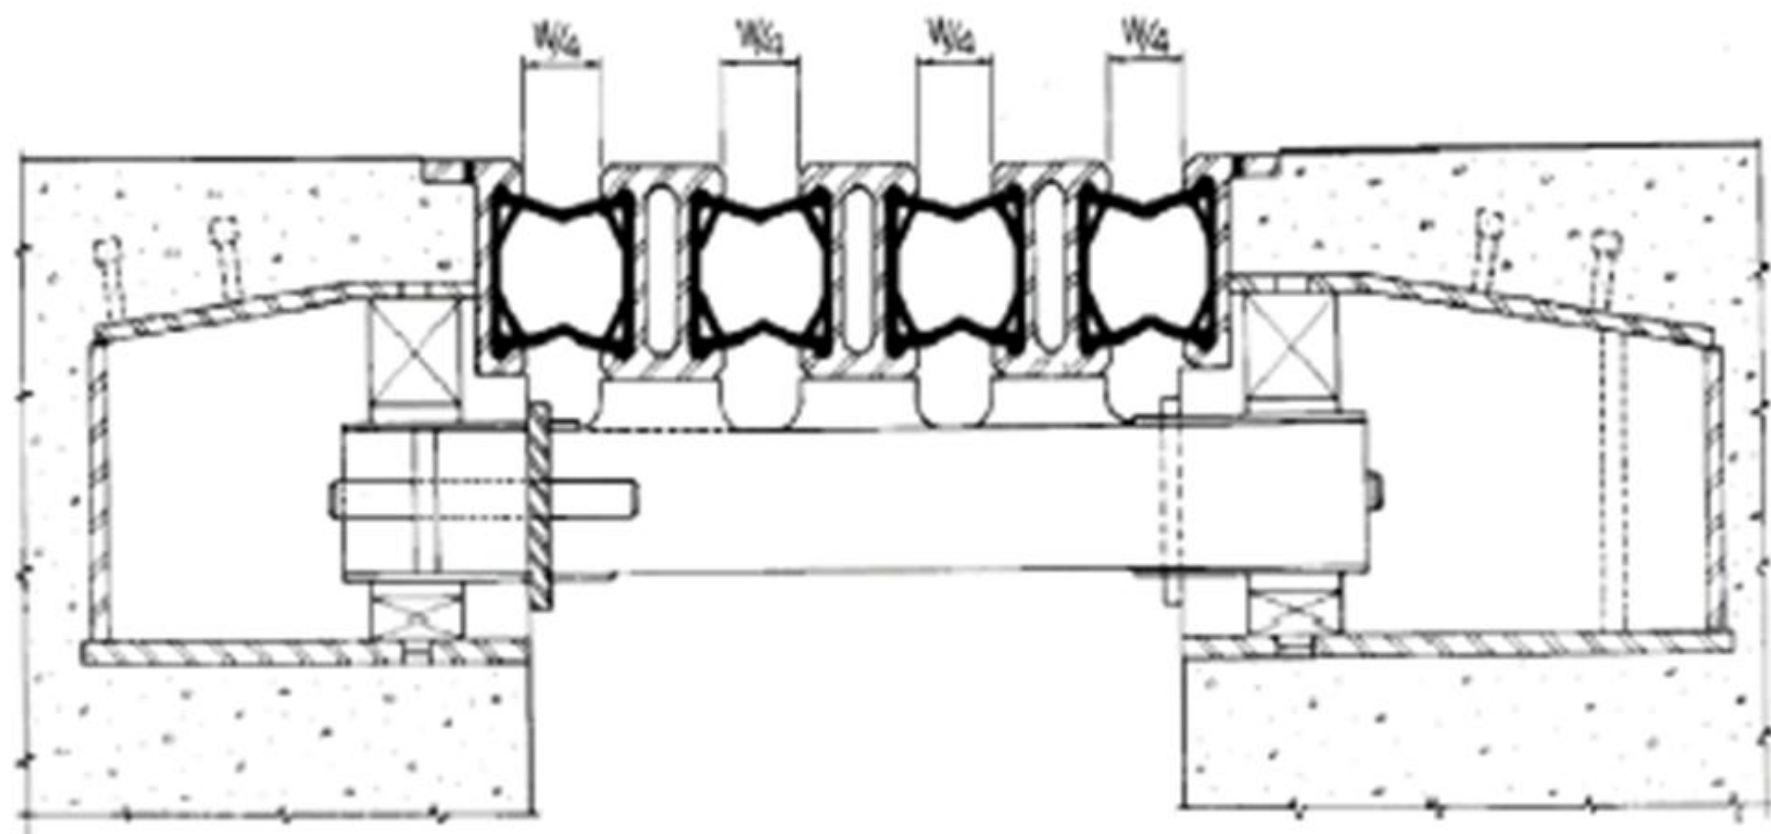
Schematic Cross Section of a Modular Elastomeric Seal
